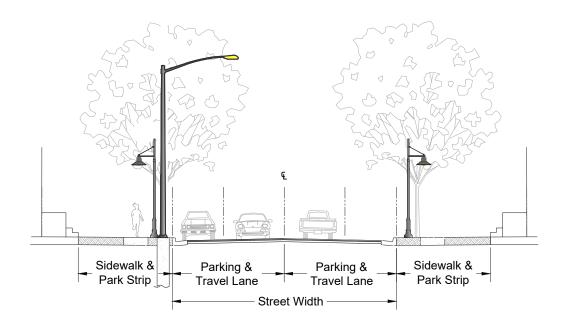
Typical Local Street with Non-Continuous Street and Continuous Ped Lighting Cross Section
